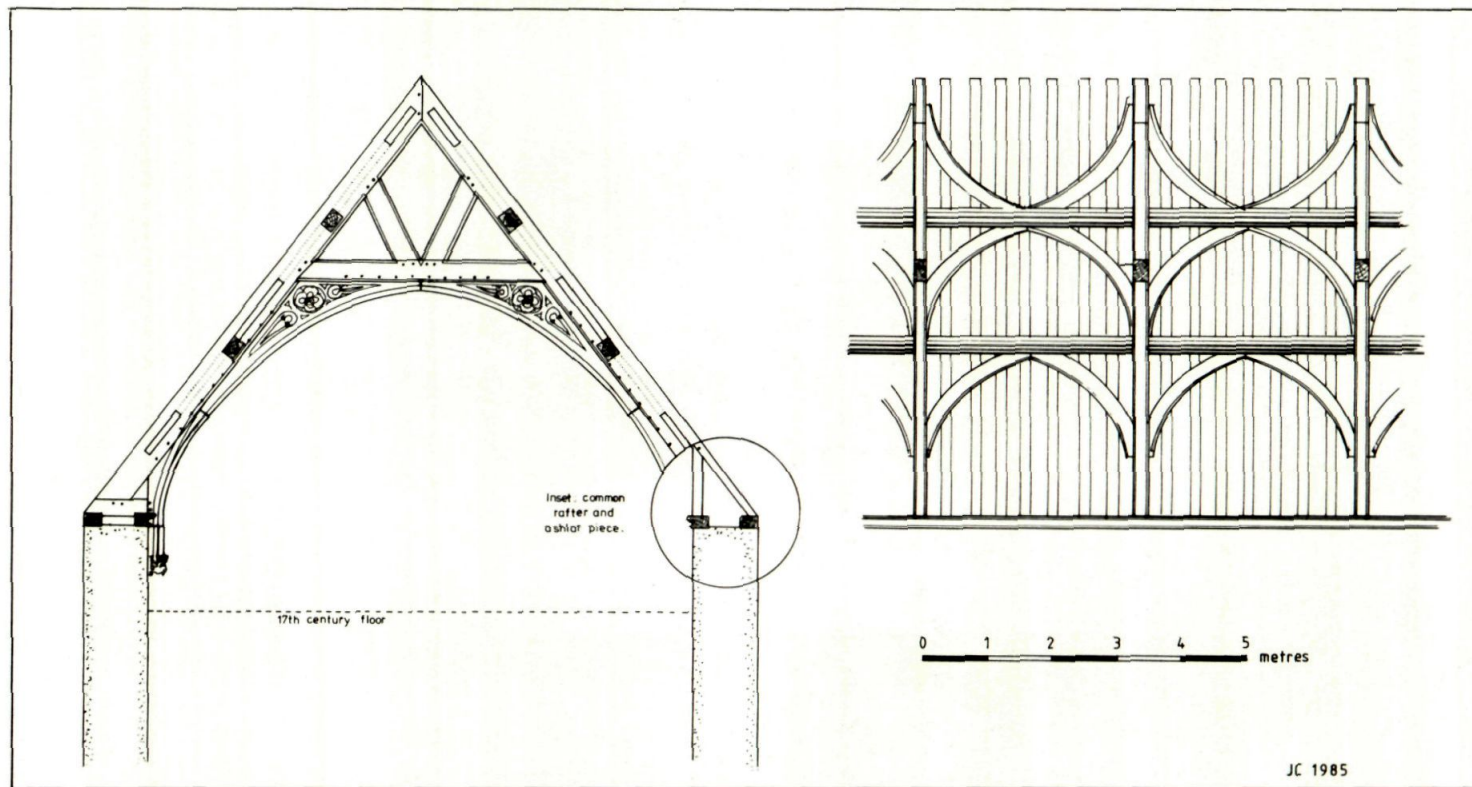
Elevation of typical truss of Prior's Hall roof (Truss III from N) and longitudinal elevation of two bays.
